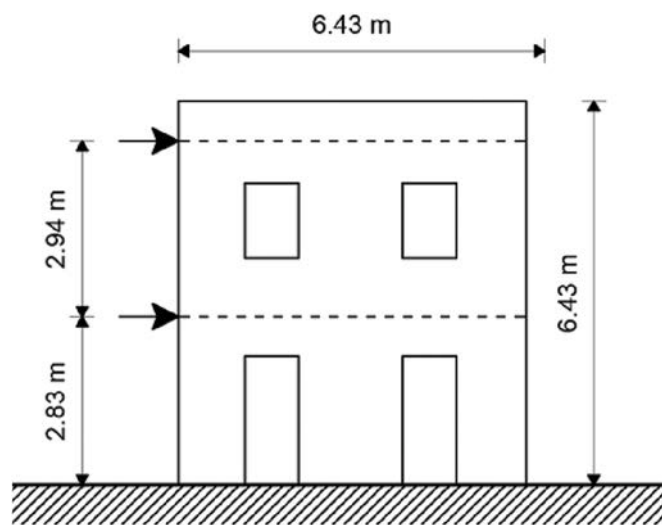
Geometric scheme of the “Door Wall” in Pavia.
